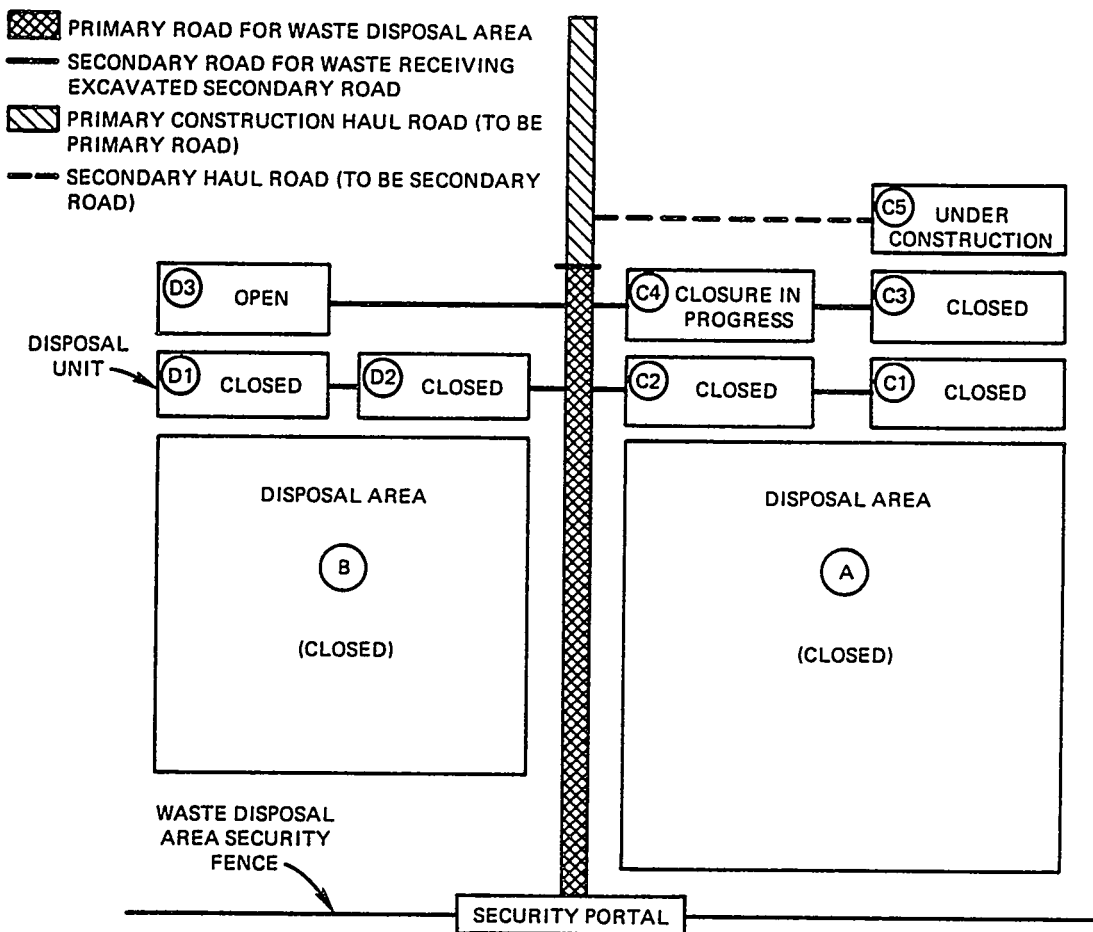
Typical site utilization plan for a shallow land burial facility (not to scale).
